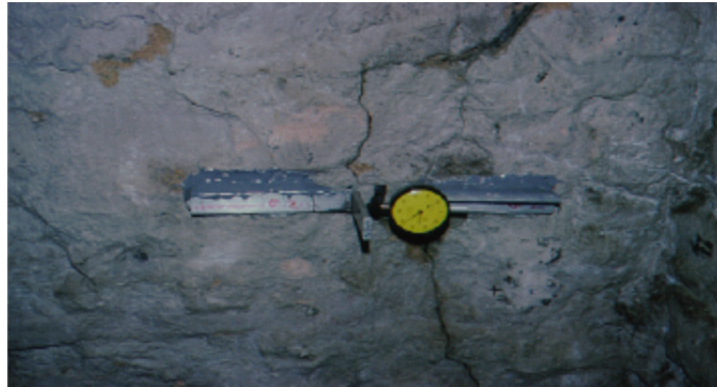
Crack gage installed across a concrete crack (Smoak, 2004)
